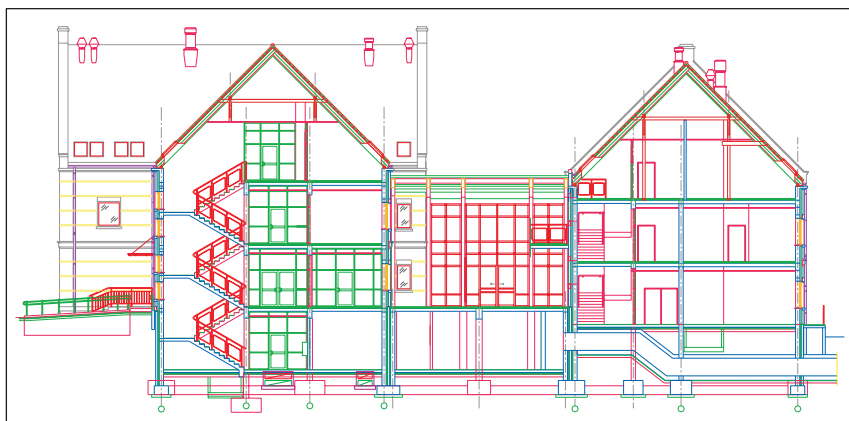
The vertical cross-section of the building. Author: M. ZAGROBA
